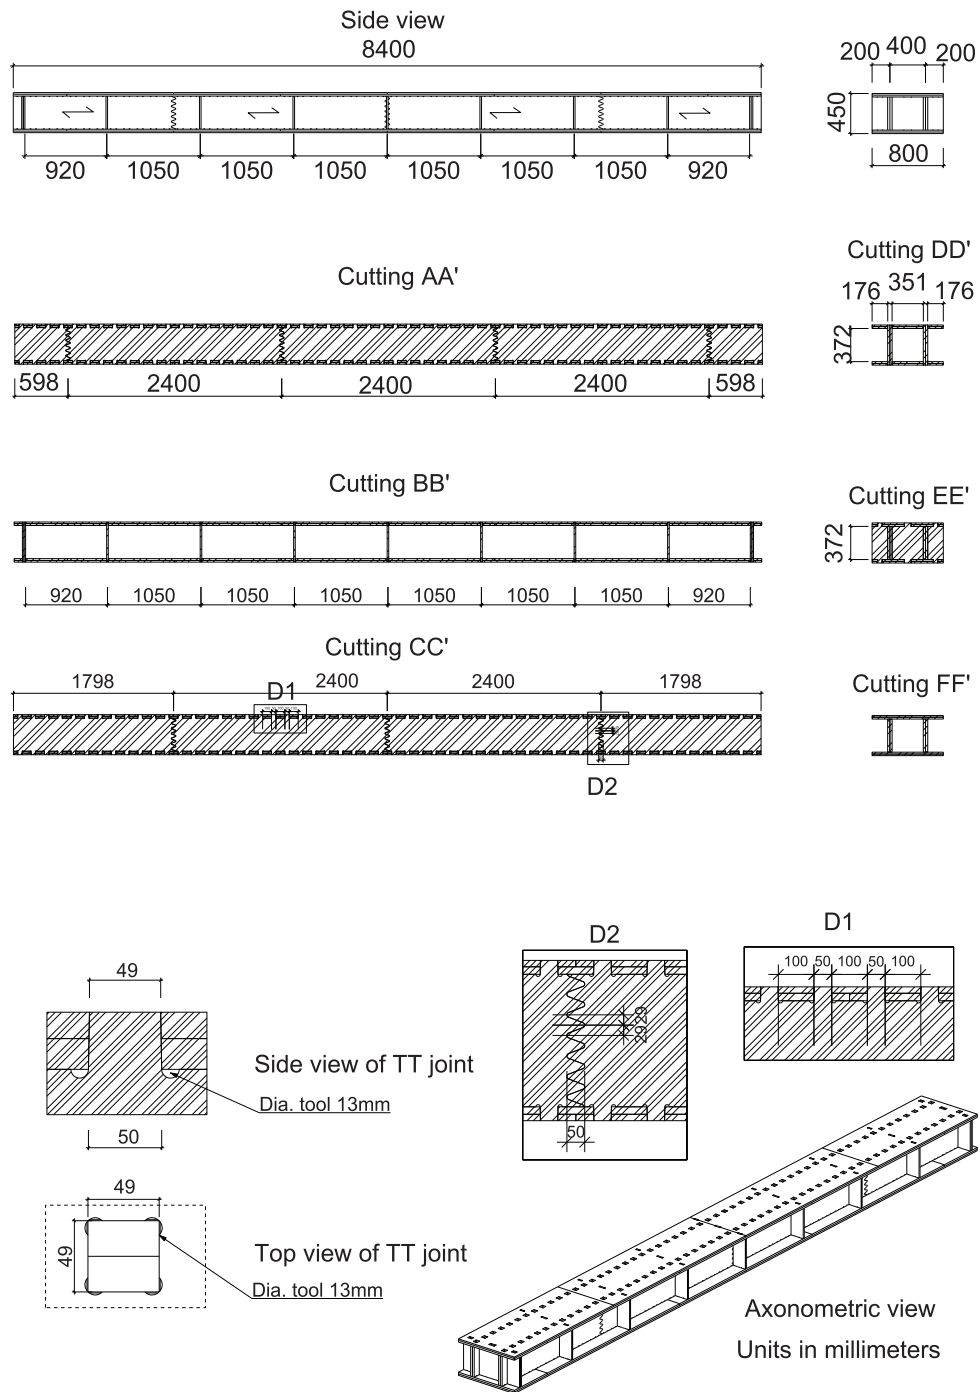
Detailed plan of large-scale specimens: part 2.
